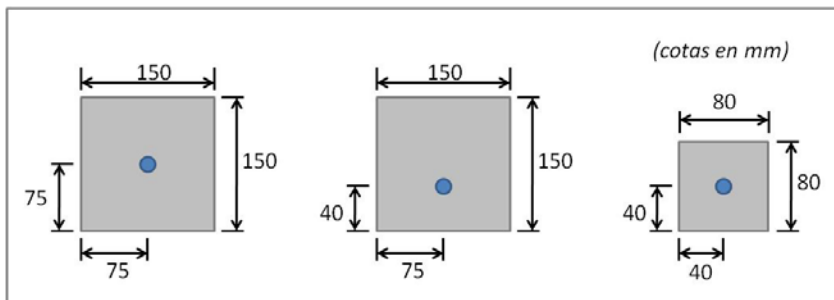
Concrete cover values as considered by Dupont & Vandewalle (2002).
